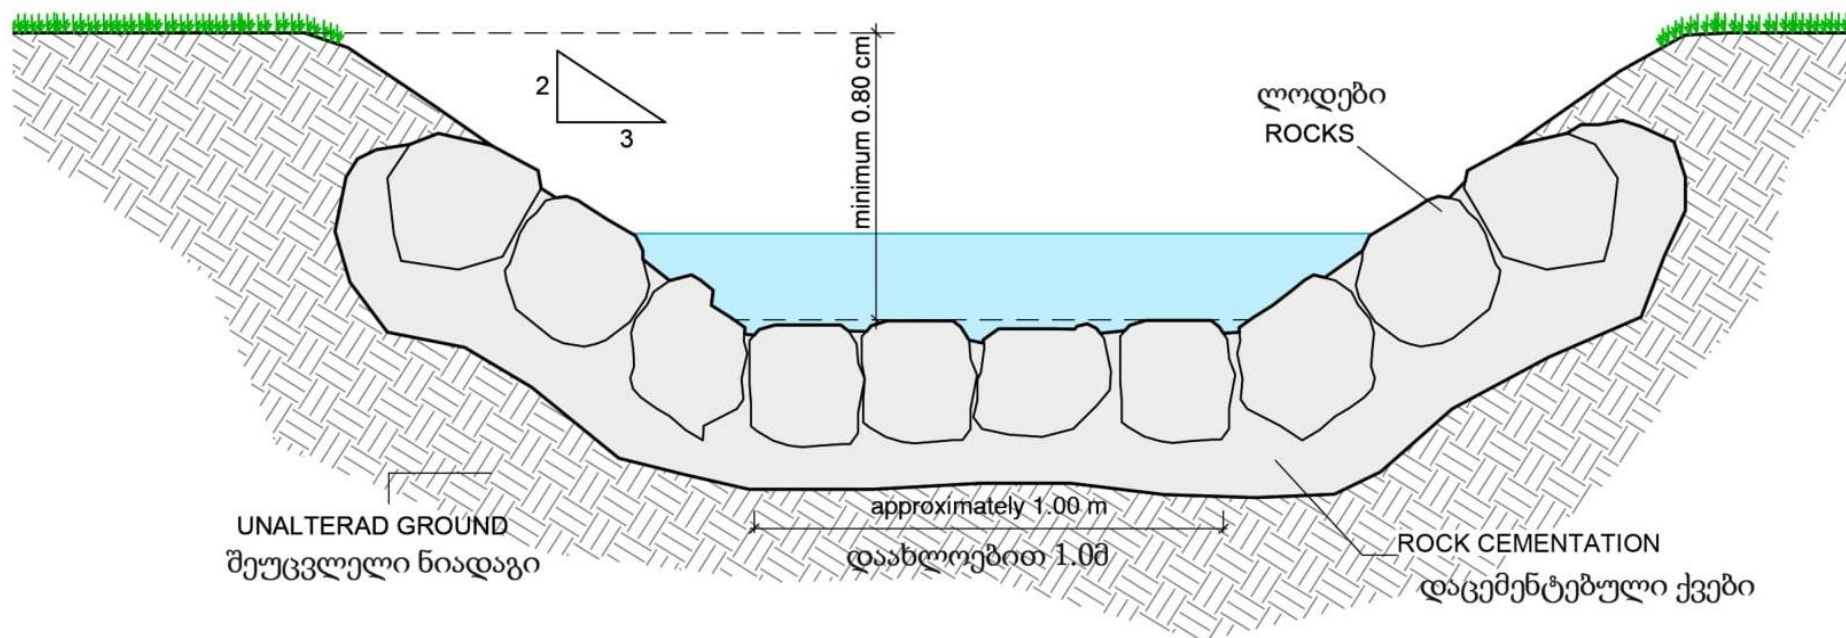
DETAIL OF DRAINAGE CHANNEL - scala 1:25
